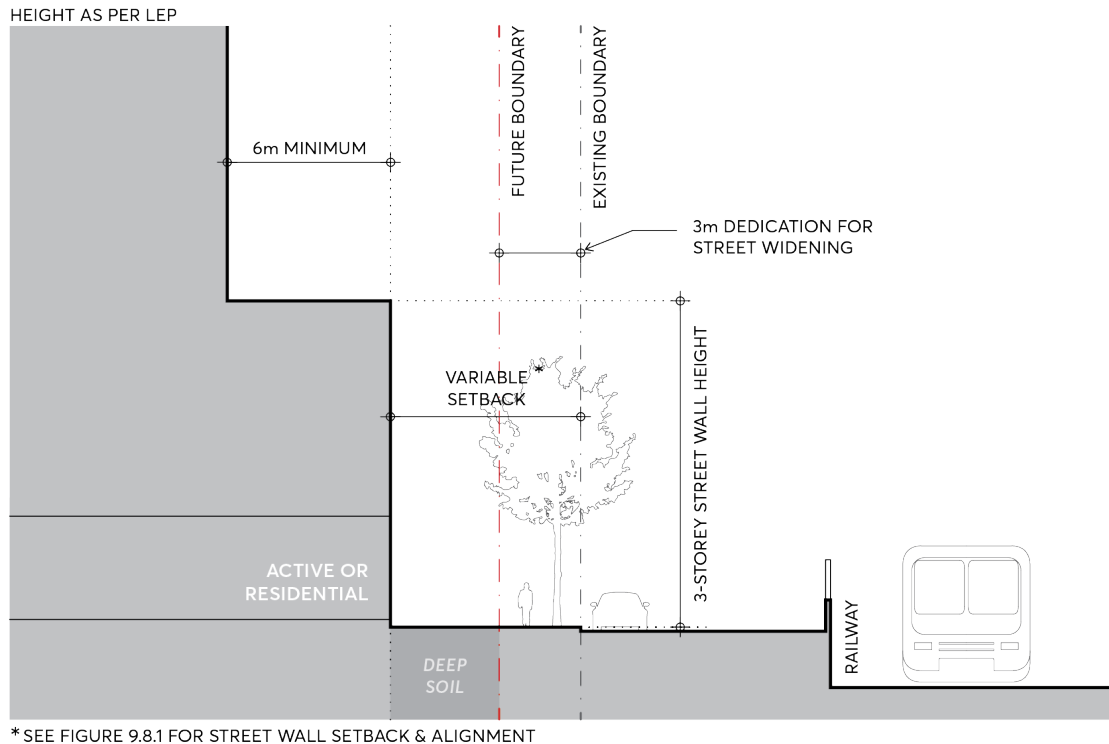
Station Street West (Section A) Setbacks and Street Wall Height
